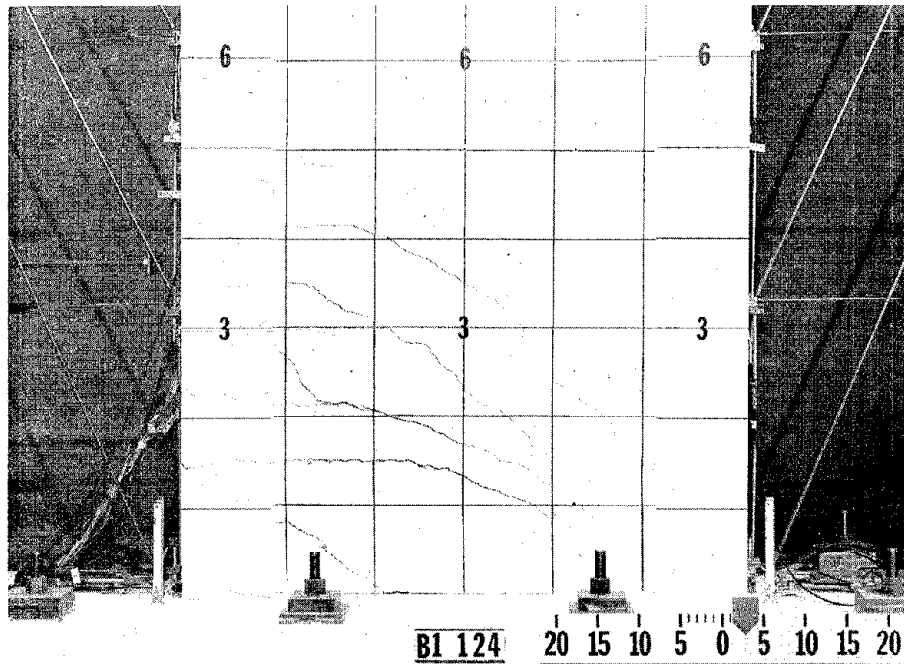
Specimen B1 With Top Deflection of +3 in.
